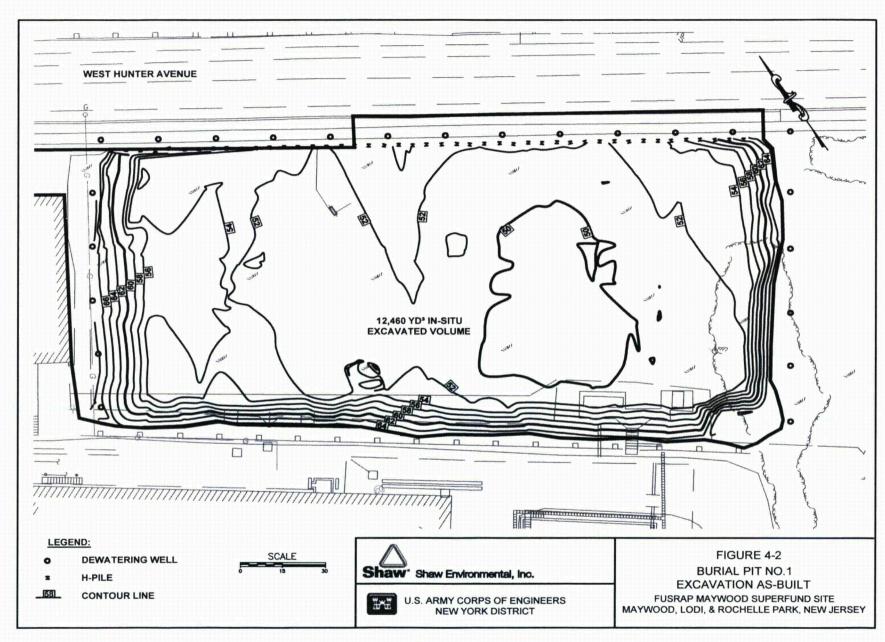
Burial Pit No. 1 Excavation As-Built
